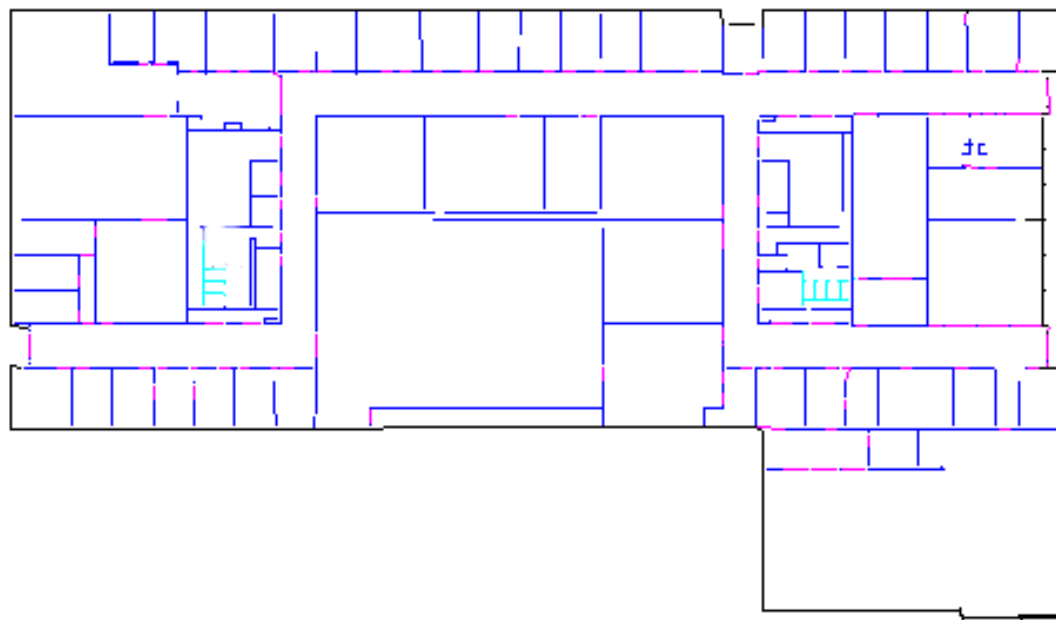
SMT Plus formatted AutoCAD drawing of a building floor plan.
